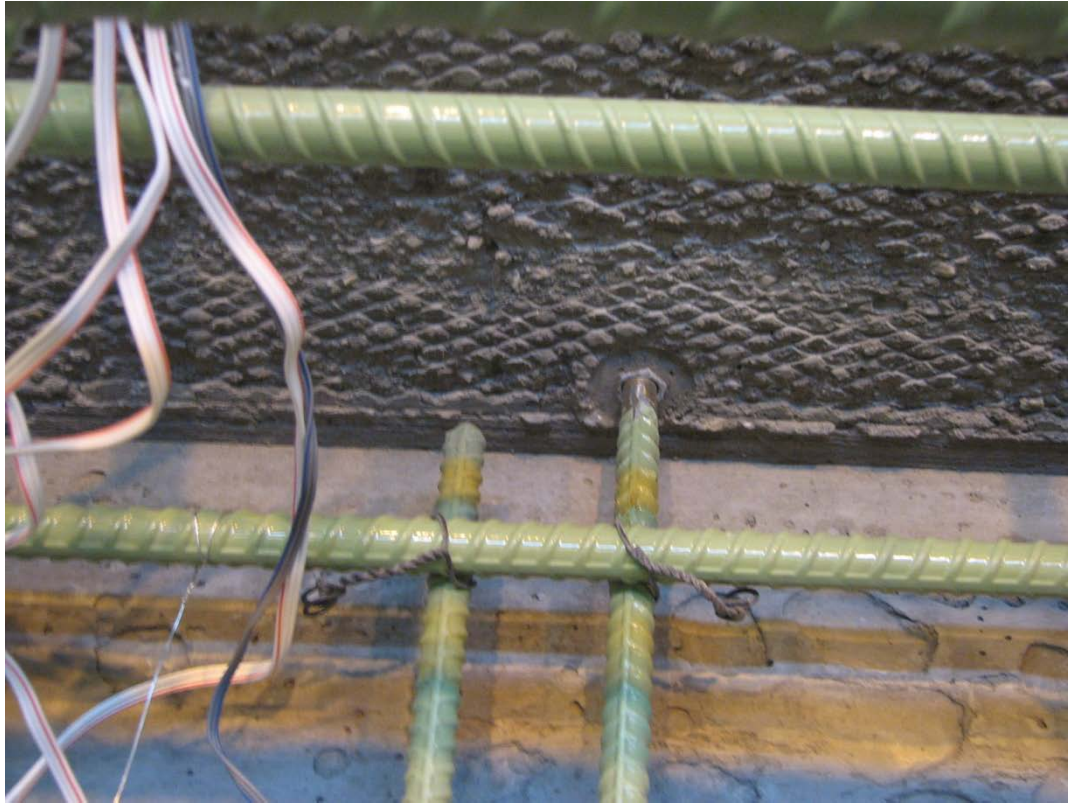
Threaded connection and adjacent termination detail of straight bars in east half span of the Concept 2 laboratory bridge specimen
